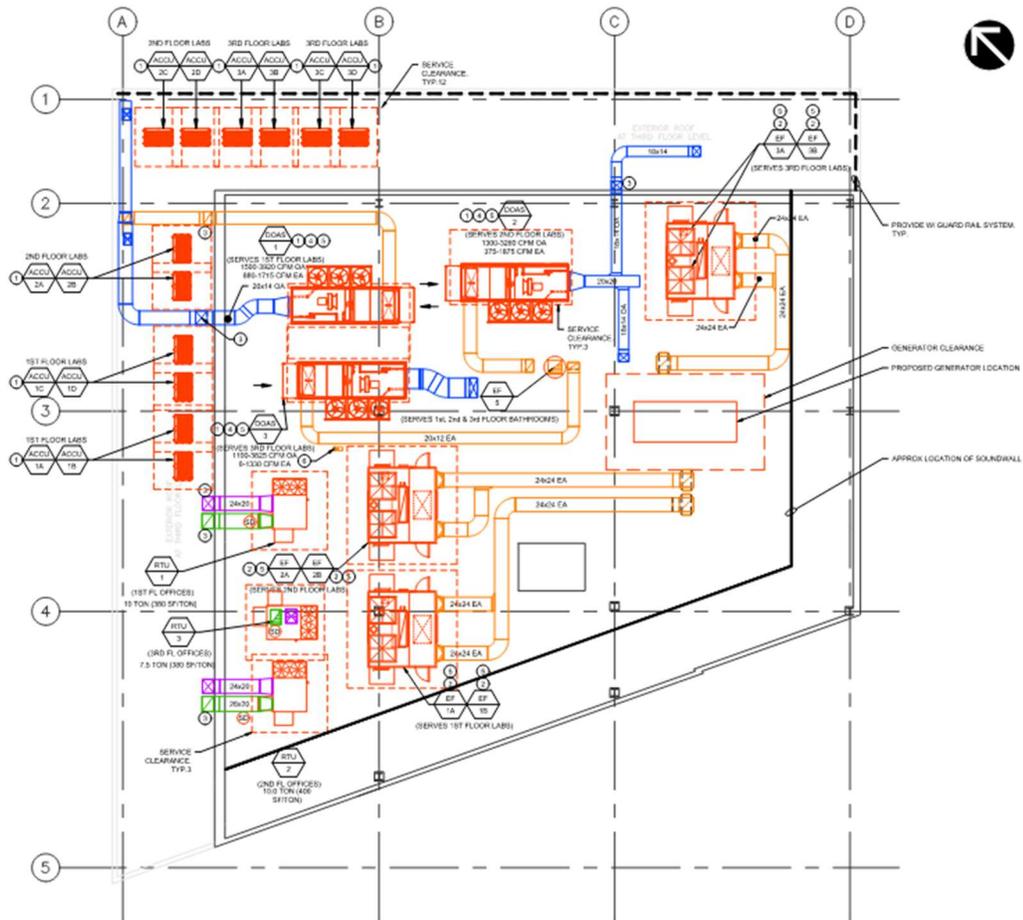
Proposed Mechanical Roof Plan (image courtesy of KS Partners LLC)
